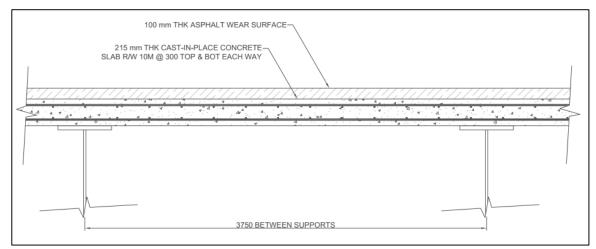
Bridge Deck Design (Alloy Consulting Ltd., 2015)
